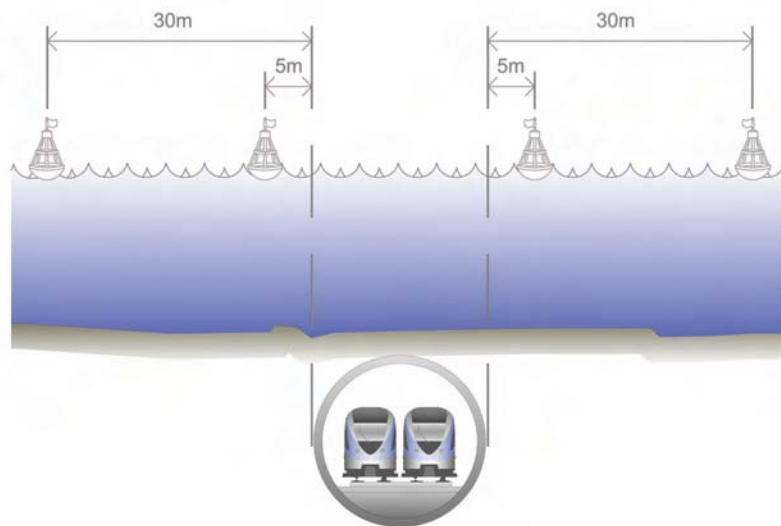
Site Preparation – Marine Works Site above Railway Tunnels
